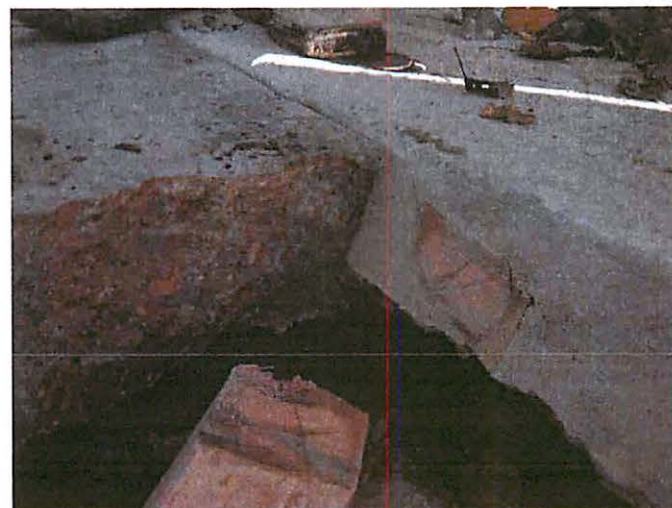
Wood in concrete pad (ST-2 location). 11-9-12.
